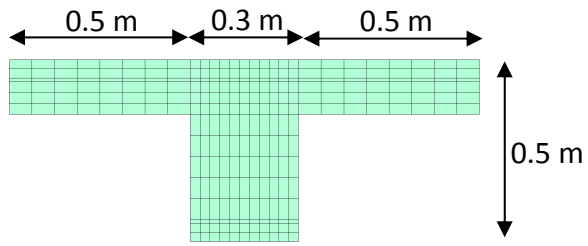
Middle girder cross sections (Axes X2, Y2, and Y3)
